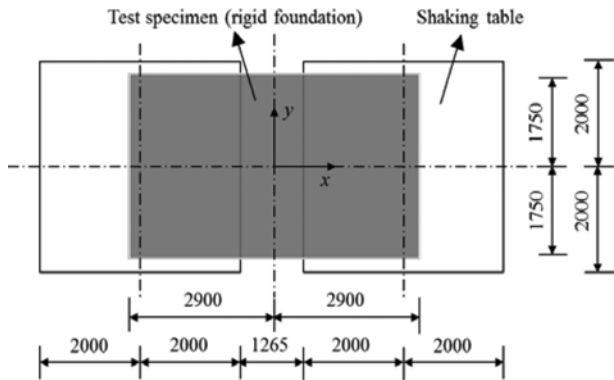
Layout of the Test Model and Shaking Tables (unit: mm)
